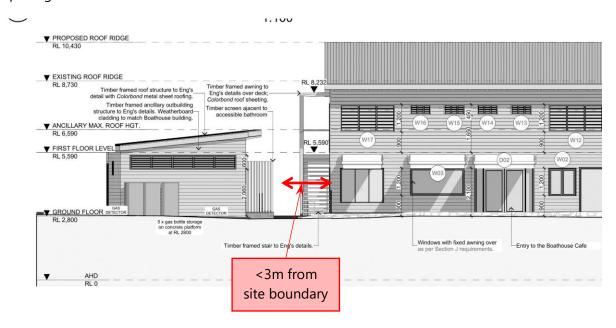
East Elevation (Corner of Main Building Within 3m of Site Boundary)
